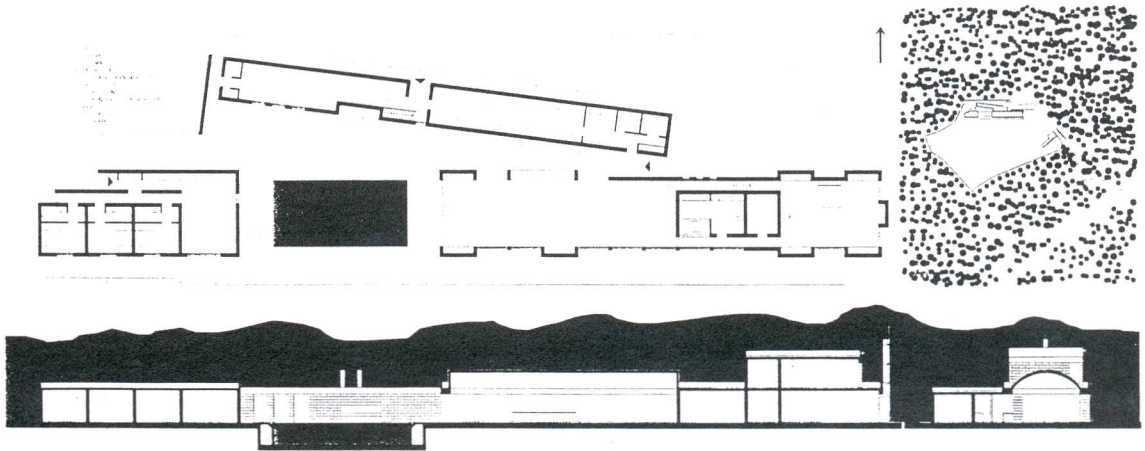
Tekirdağ House, Plan, Site organisation (Source: Mimarlık 7, 1998)
